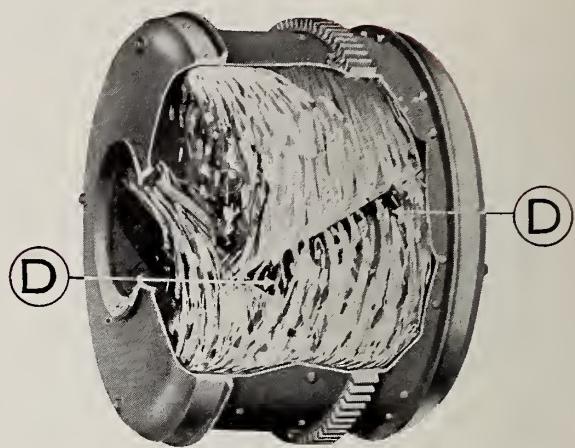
Interior View of Mixer Drum mixing a Batch of Concrete.
